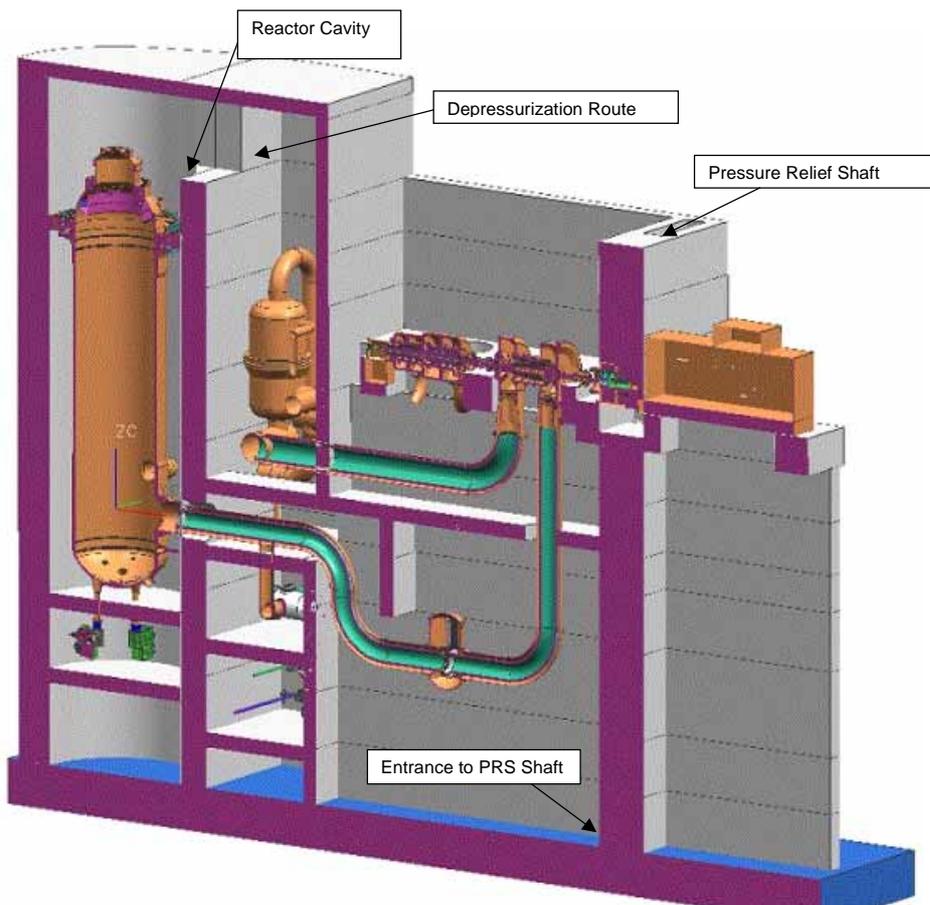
Cross-sectional view of main power system in building, showing depressurization path.
